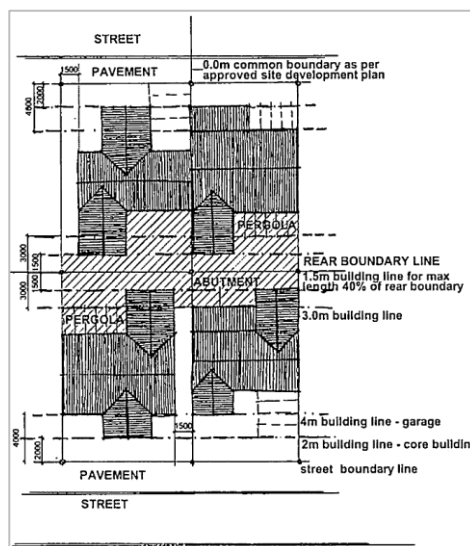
Illustration of stepped building line along rear boundary that encourages a varied building footprint.
